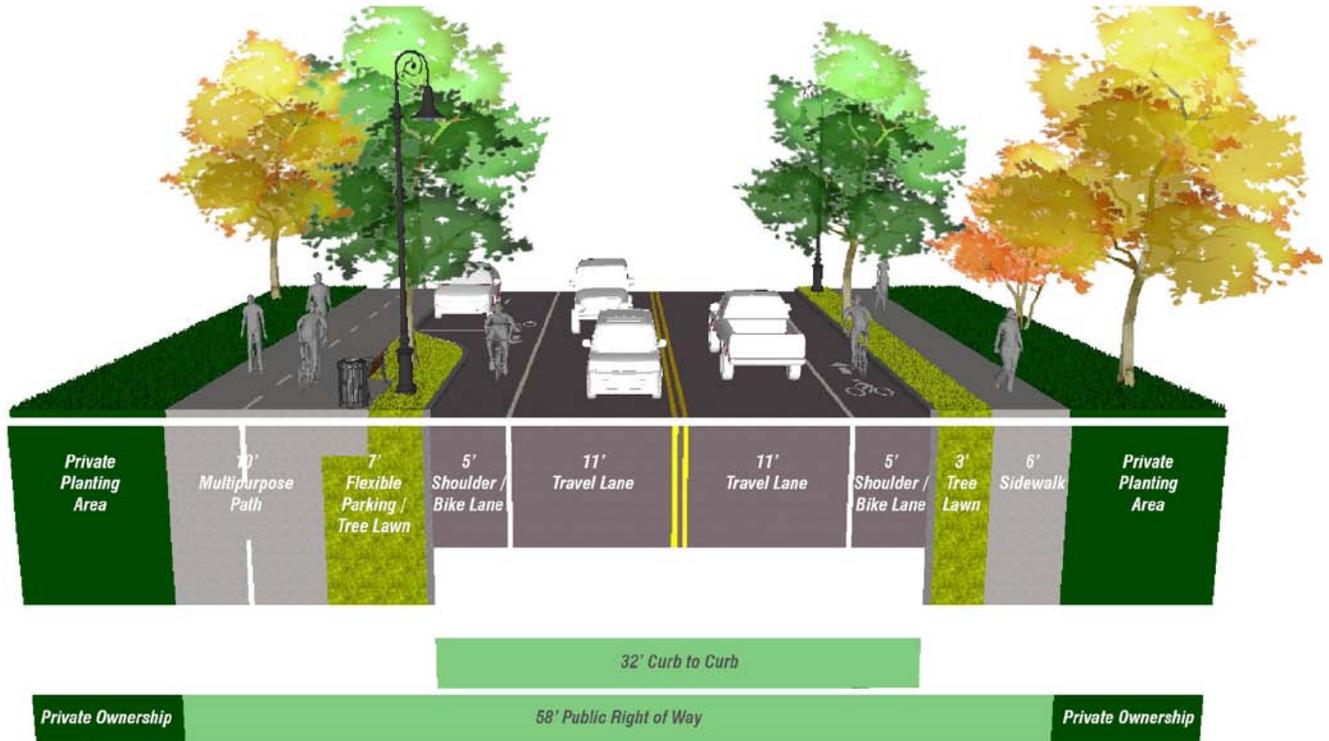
Proposed Section: Multi-purpose and recreational linkage
